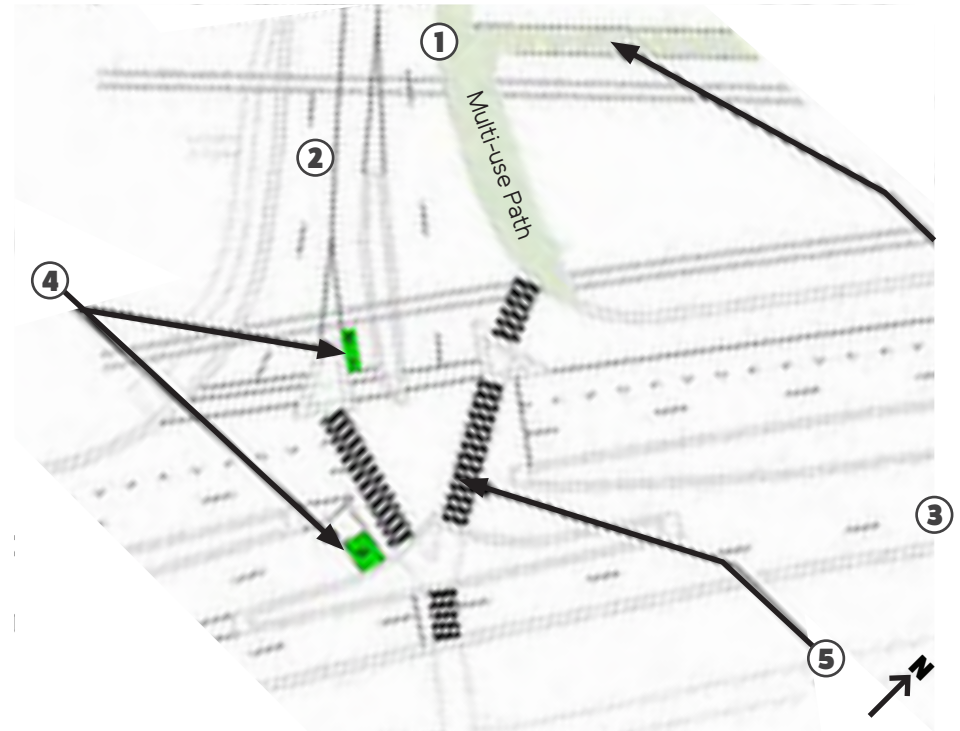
Broom Street Intersection: Long Term Solution per Blair Street Corridor Study
